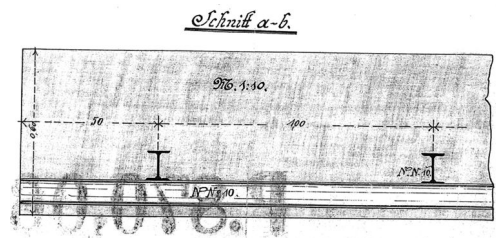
Cross-section of RC foundation slab with rigid reinforcement (City Building Archive).
